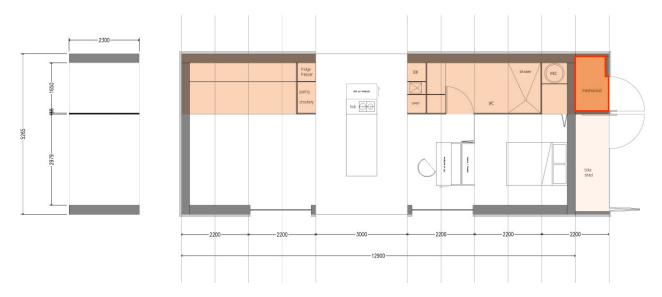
Working floor plan with the plant in its final location at the eastern end of the house. As the highlighted area shows, in the plant the plant room is still a part of the 'services core zone' running along the back wall; the original concept was in fact strengthened by this adjustment.
